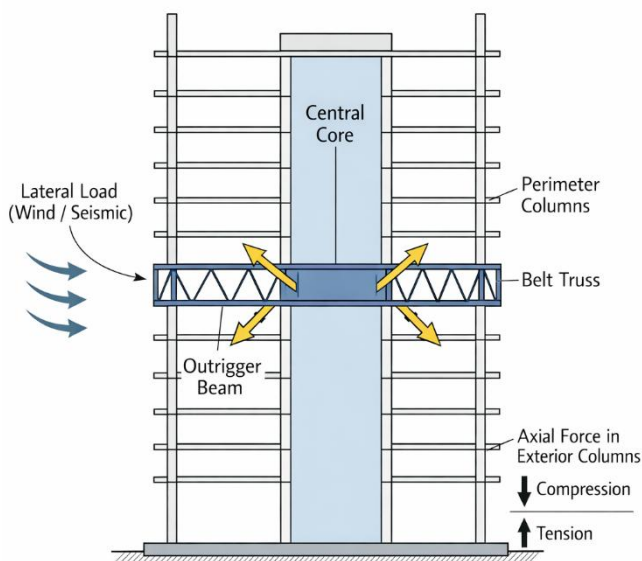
Conceptual diagram of a multistory building's belt truss as well as outrigger structure demonstrating how the center core and outer columns are connected for increased lateral stiffness.
